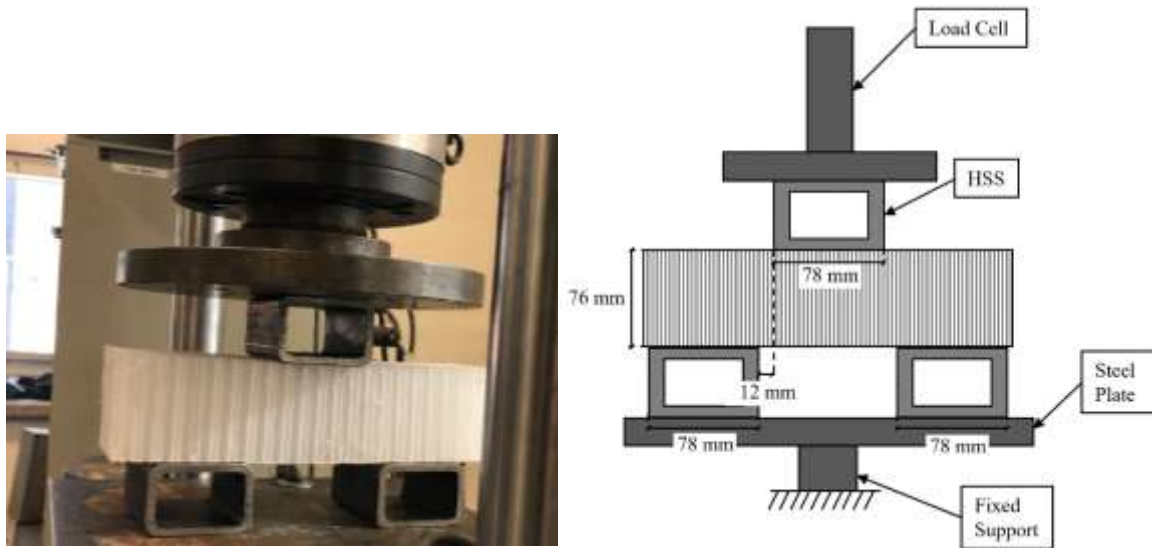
Shear test set-up; (a) front view; and (b) sketch including dimensional details.
